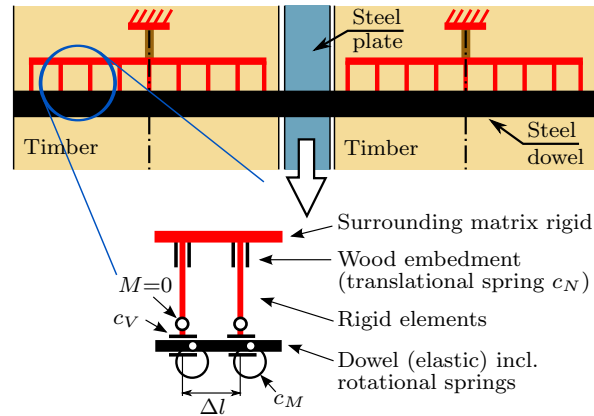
Visualization of structural elements for the single dowel model, exemplarily illustrated by means of a double shear, steel-to-timber connection.
